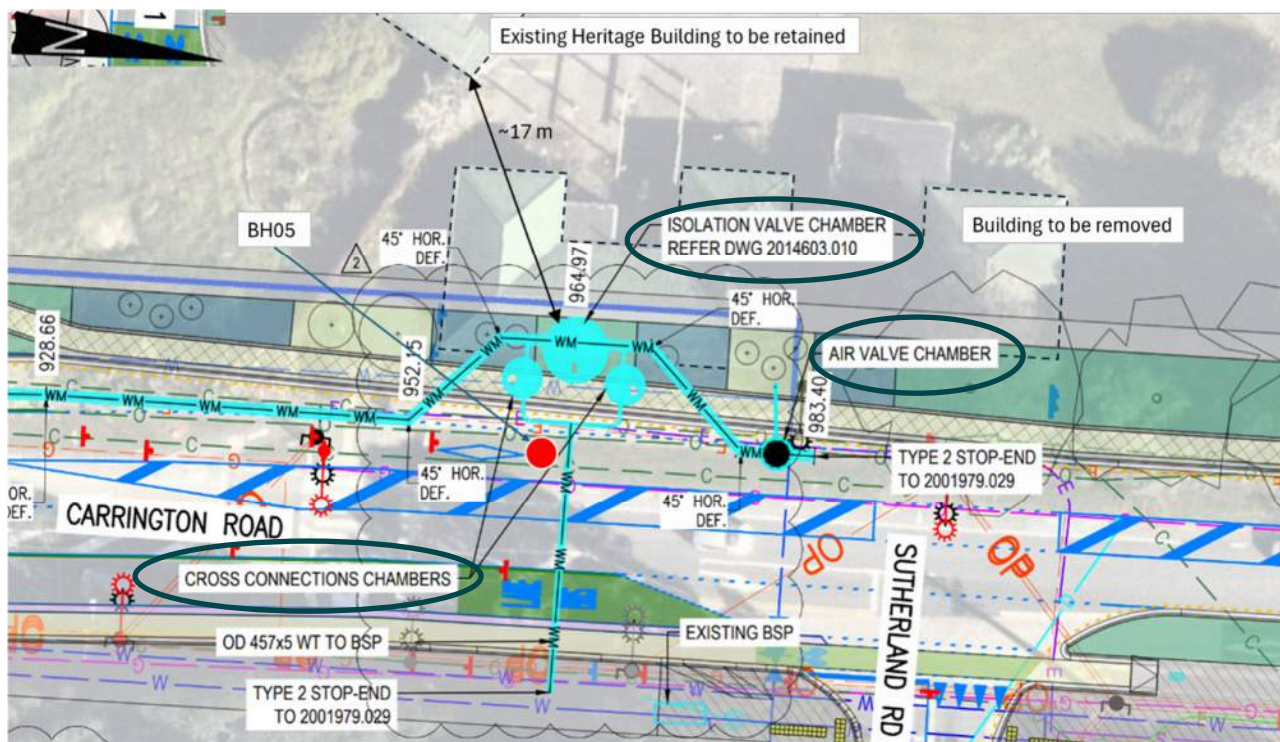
Excerpt of preliminary Point Chevalier Watermain No. 2 – Layout Plan and Pipe Longitudinal Section - Sheet 7 (DWG 2014603.408 Rev B) showing isolation and cross connection valve chambers in relation to existing heritage building (Oakley Hospital Main Building).
